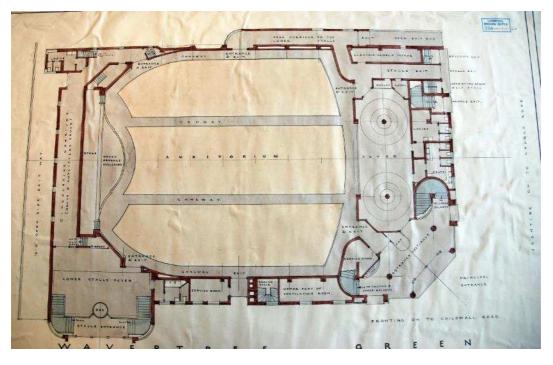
Image of proposed ground floor plan dated January 1937 (Source: Liverpool Record Office CE7726)
